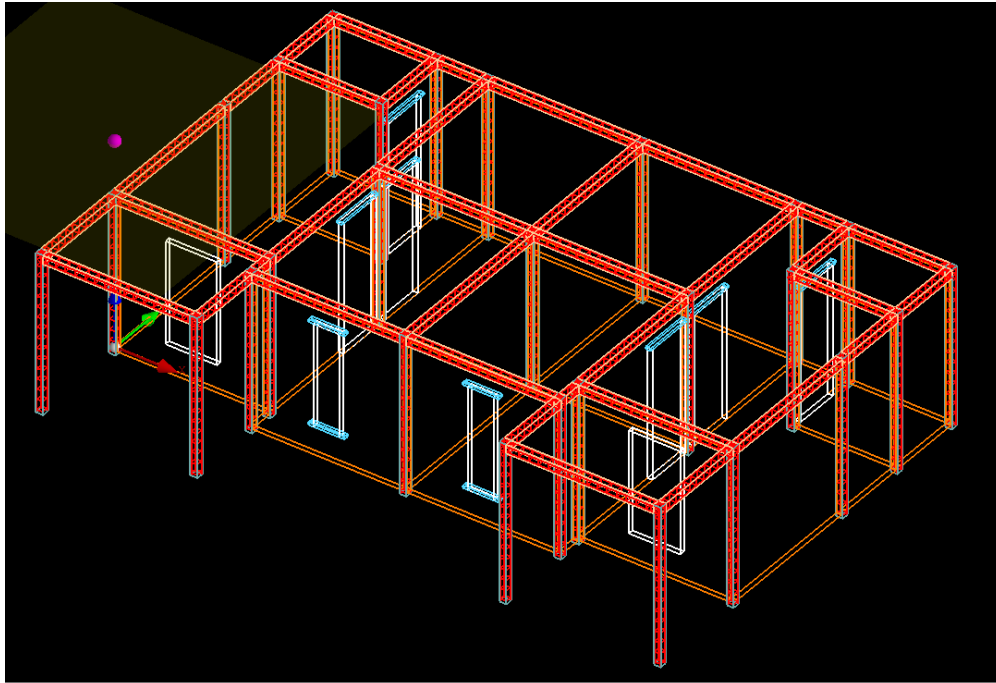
15. Reinforcement of RC Buildings Numerical Model
